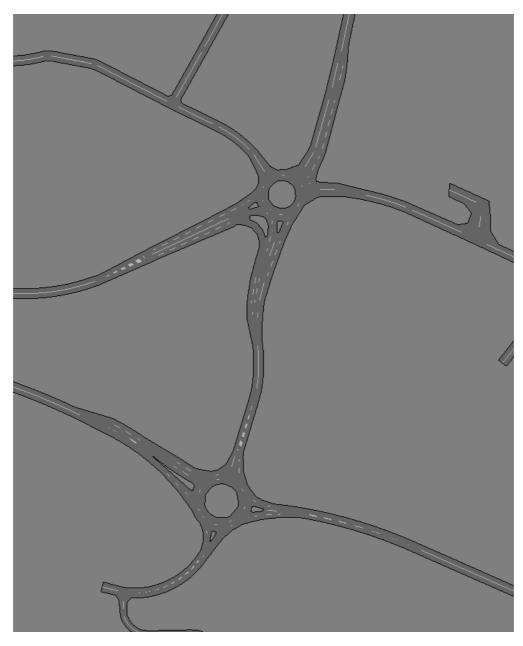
Power Station/Manor Bridge Roundabout Improvements
